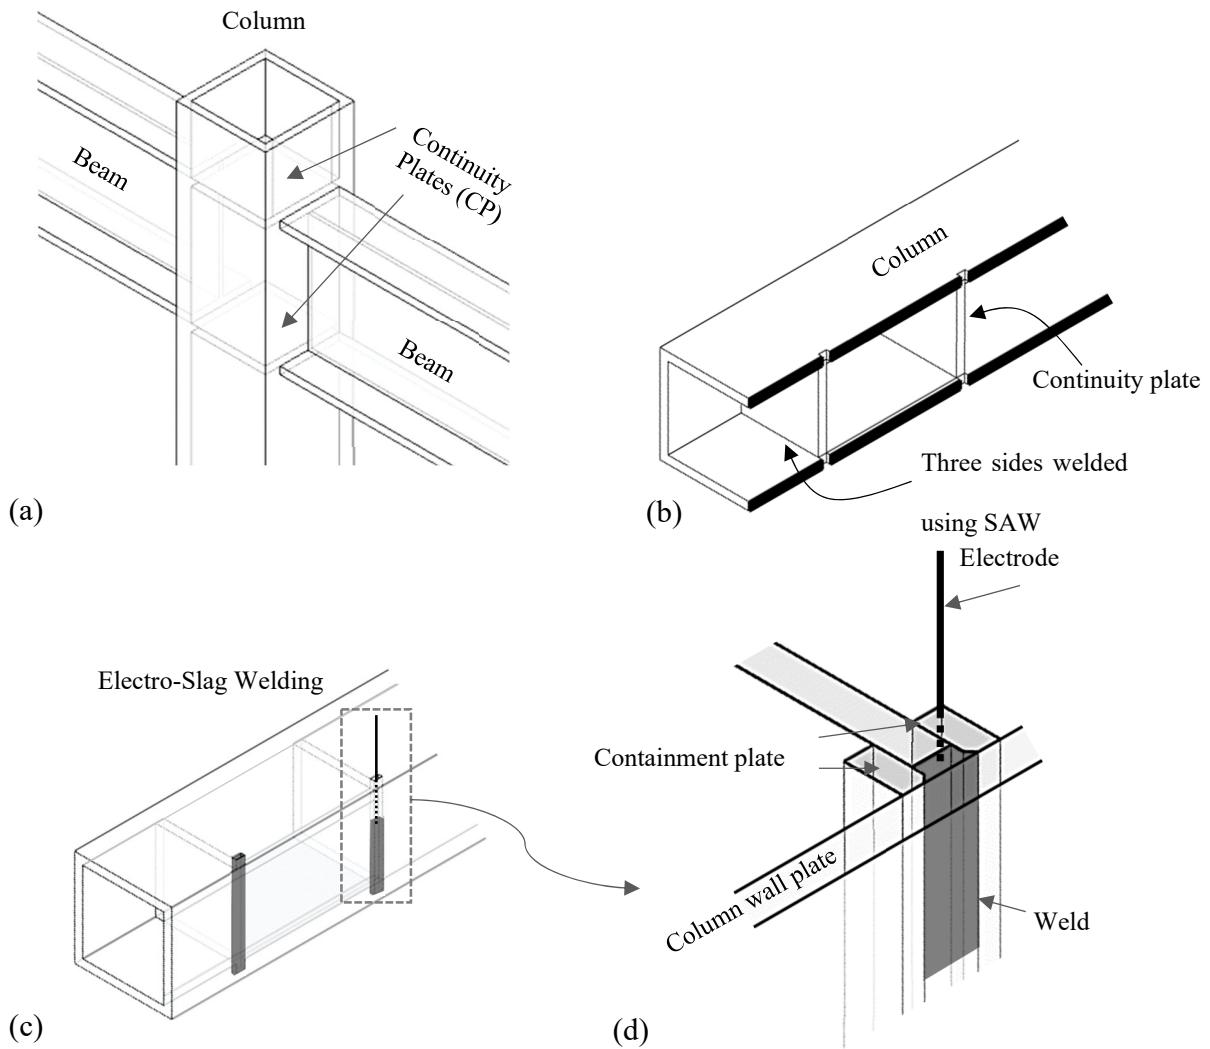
1 – Fabrication of beam-box-column connection: (a) overview, (b) welding on three sides of box using SAW, (c) ESW welding on fourth side after closing box (d) detail of ESW weld process
